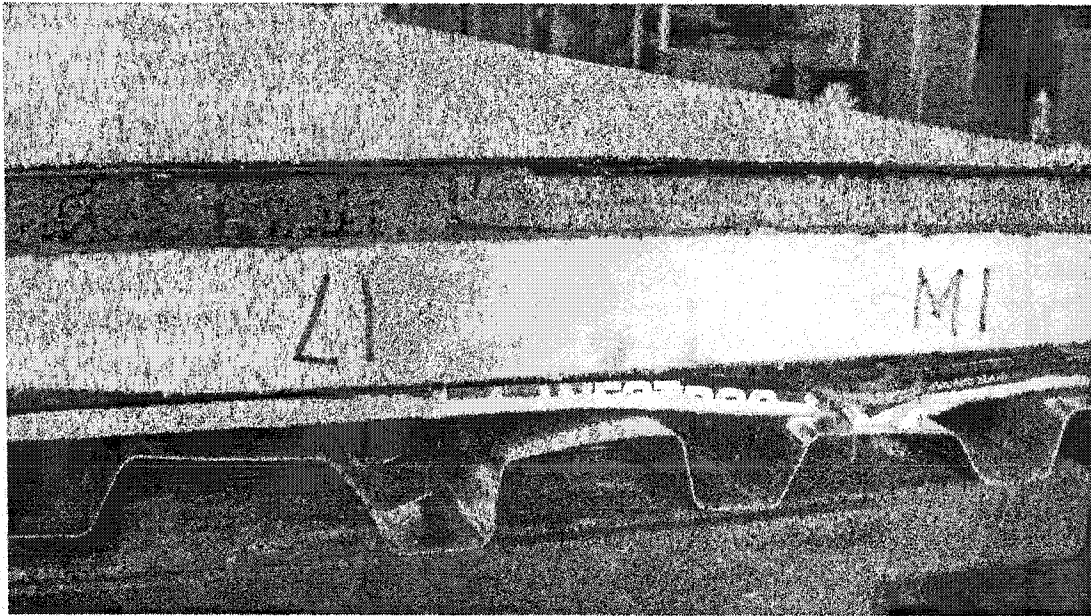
Tearing of steel sheet at L1, and cracking of gypsum board near M1
